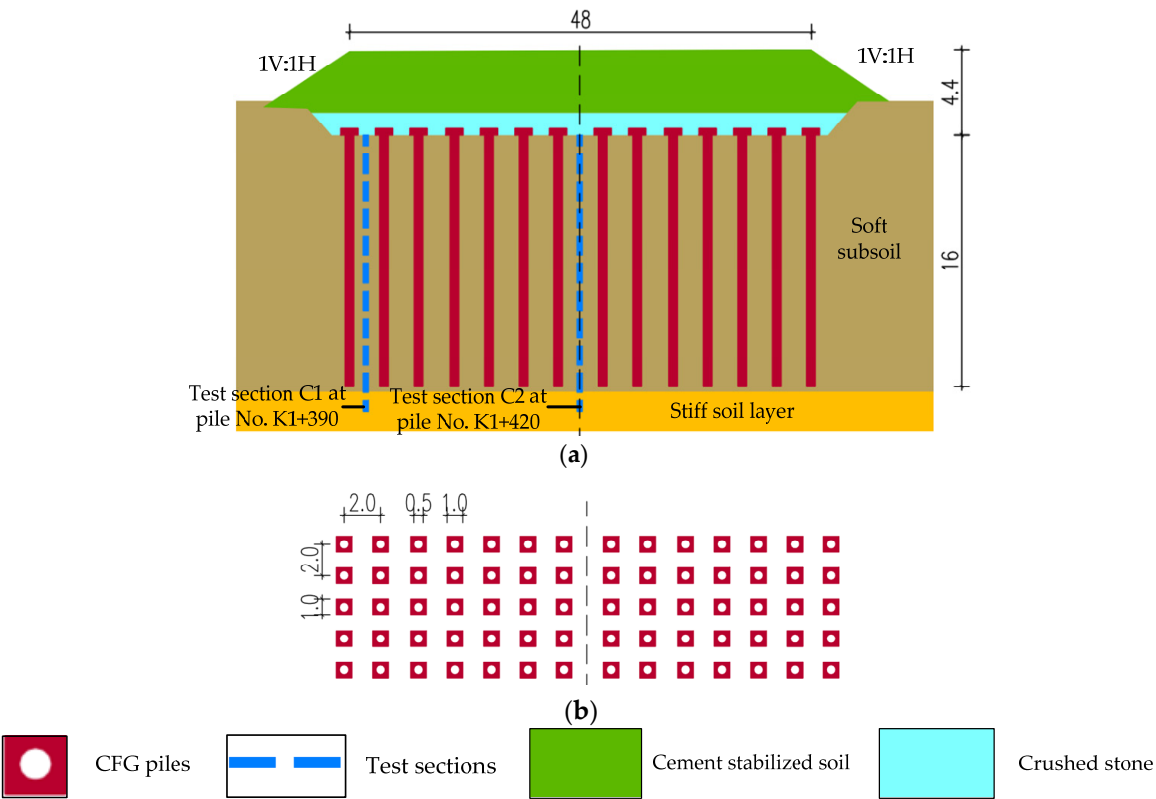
Loading schemes for CFG test: (a) Cross section. (b) Pile location layout.
